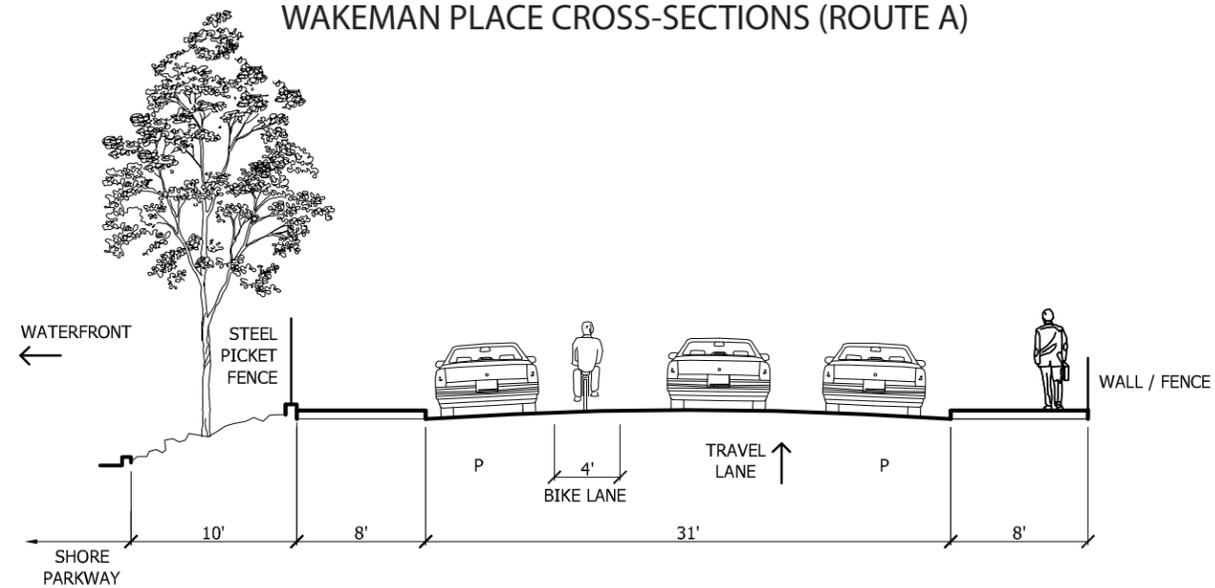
Existing configuration on Wakeman Place between Sedgwick Place and Bergen Place
